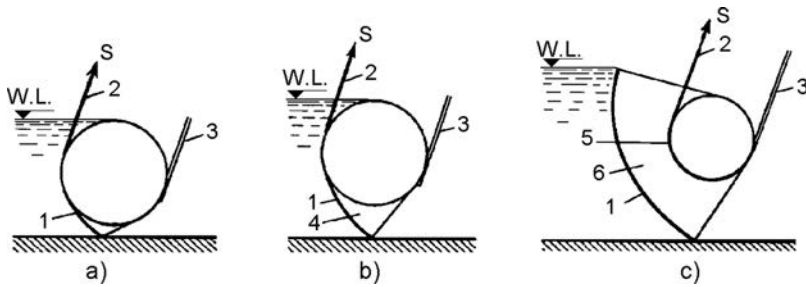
Schemes of cross-sections of roller gates. (1) Lining that takes on the hydrostatic pressure; (2) elastic rope; (3) rail track (in gate slot); (4) bottom shield; (5) lining; (6) front shield.
